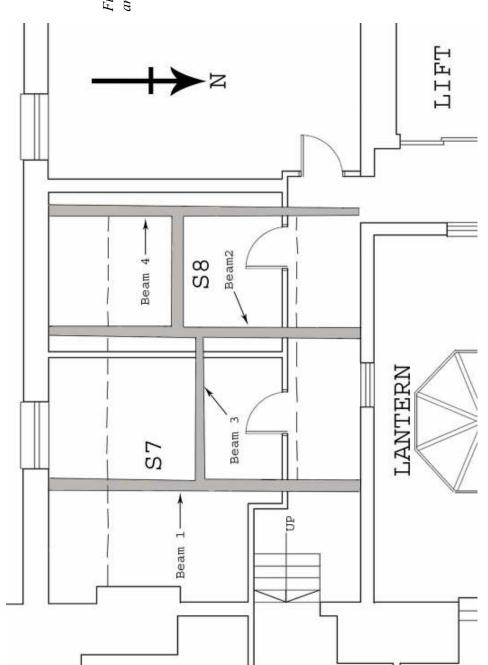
Plan of timbers in room S7 and S8 (timbers 1-4).
